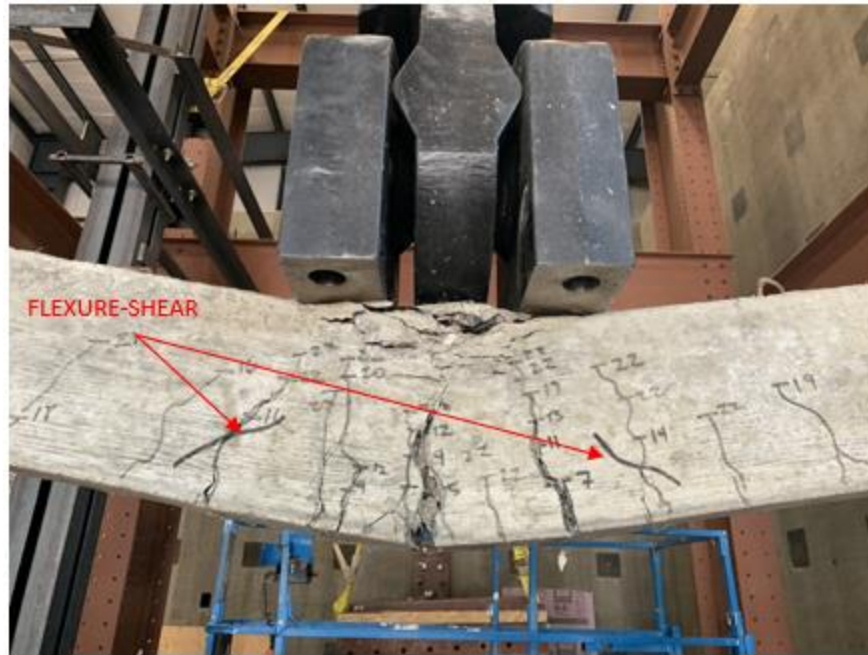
Flexural Shear Cracks Developed During Beam B7 Testing
